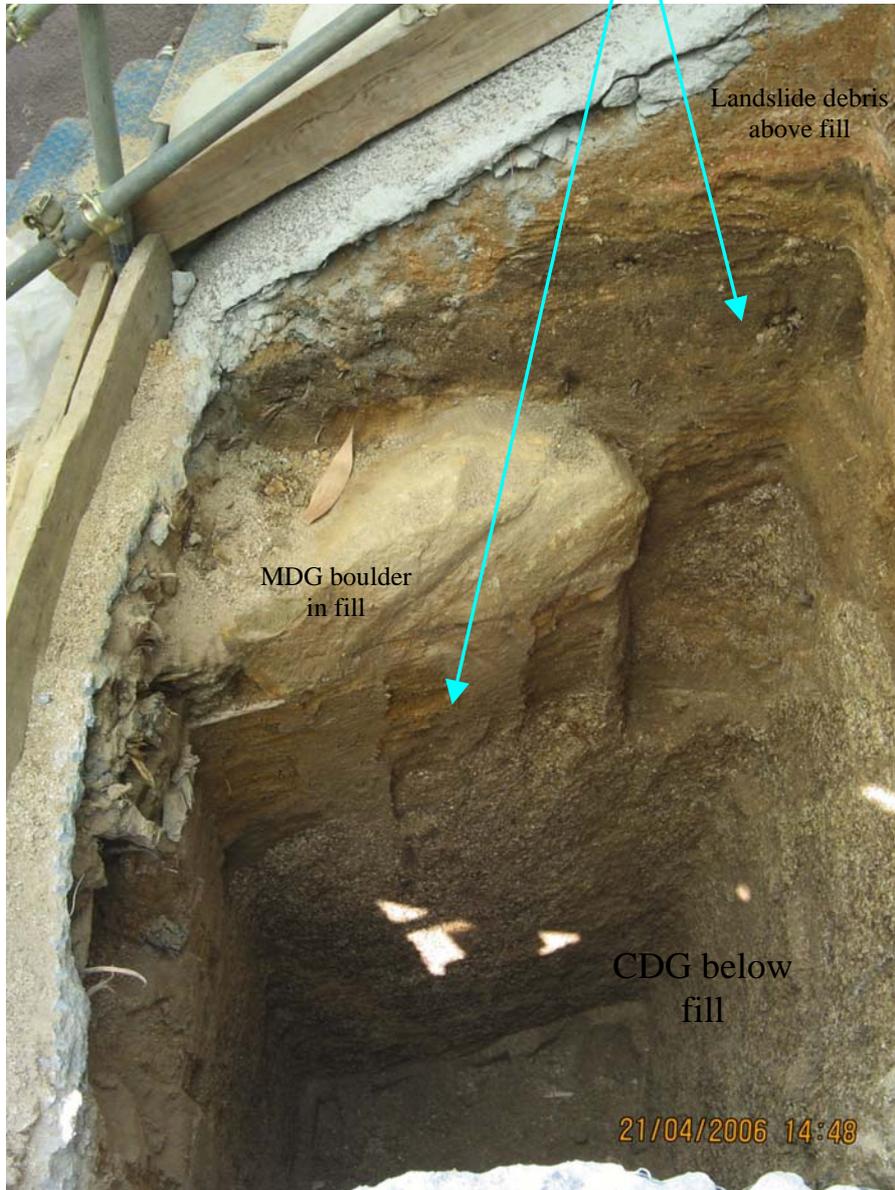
Layered Fill with Granite Boulder above CDG in Trial Pit No. TP6
